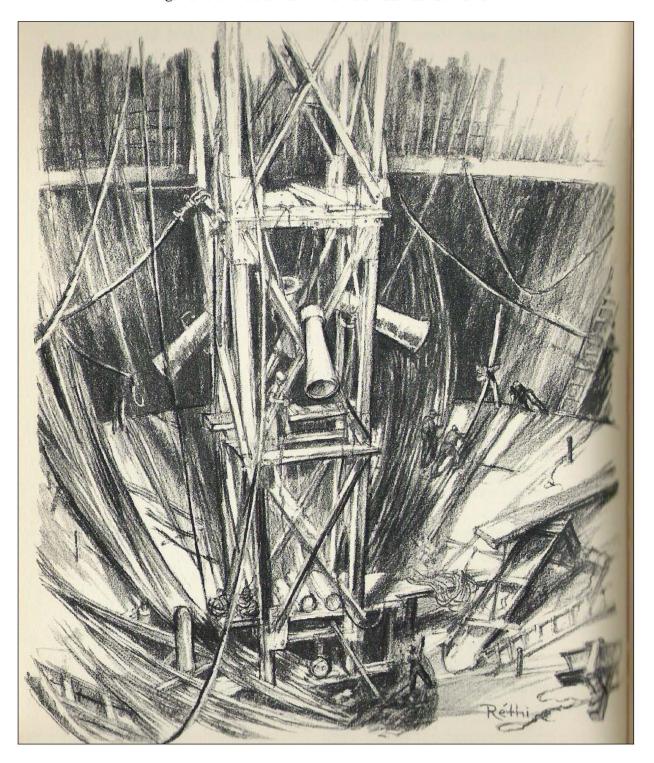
shows a sketch of a tank's lower hemisphere under construction and being lined with concrete with an inner steel lining.
